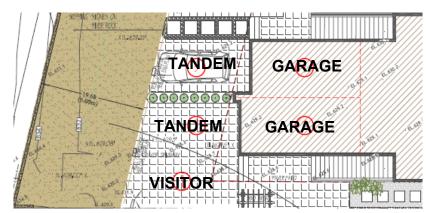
Excerpt of Site Plan (showing rear parking configuration)
